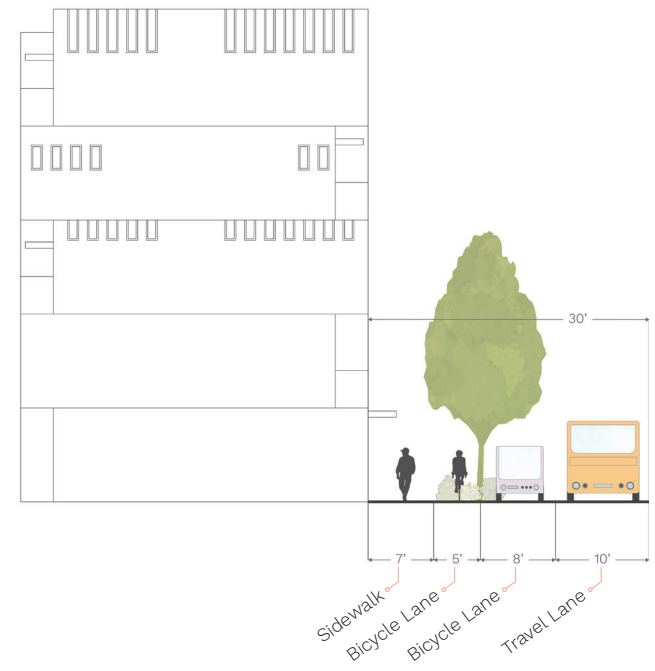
10th Ave E Design Proposal Section at Loading Zone
